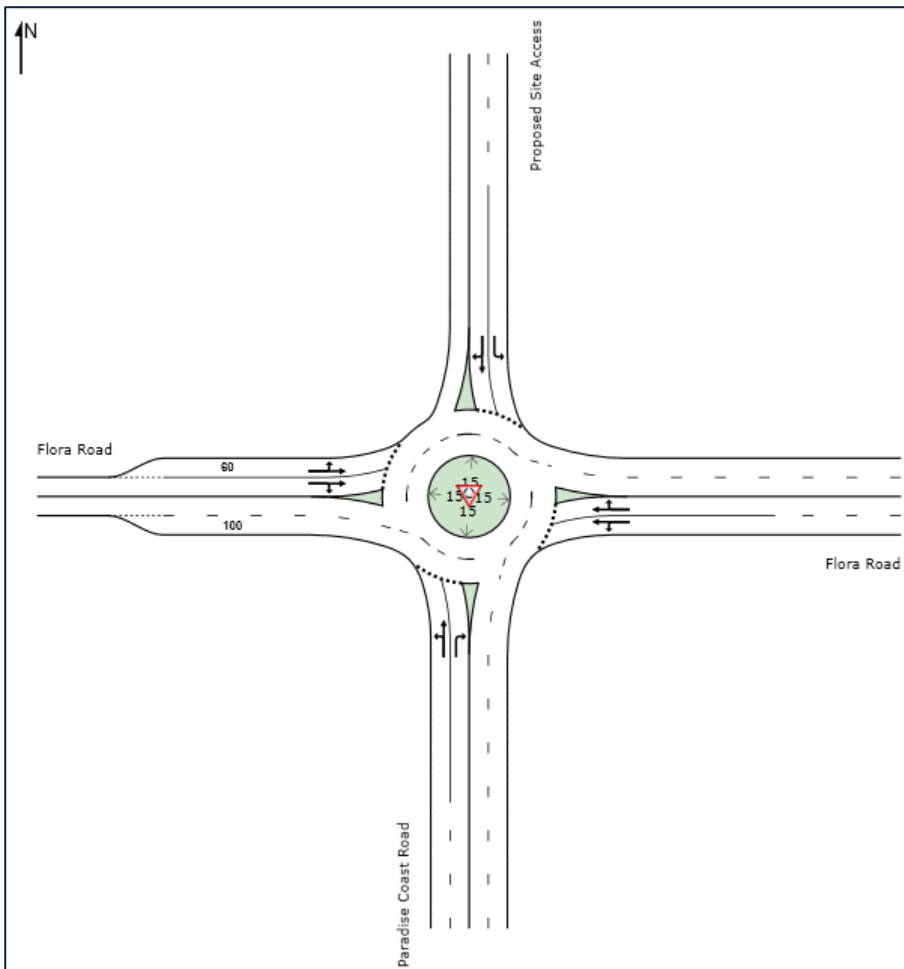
Intersection Layout: Flora Road and Site Access (opposite Paradise Coast)
